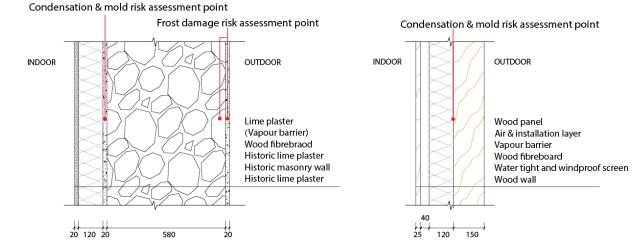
Reference constructions. Left: masonry wall with internal insulation; Right: wood wall with internal insulation.
